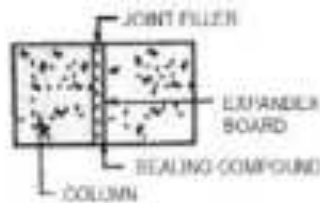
Typical Detail of Expansion Joint at Isolated Twin Columns
